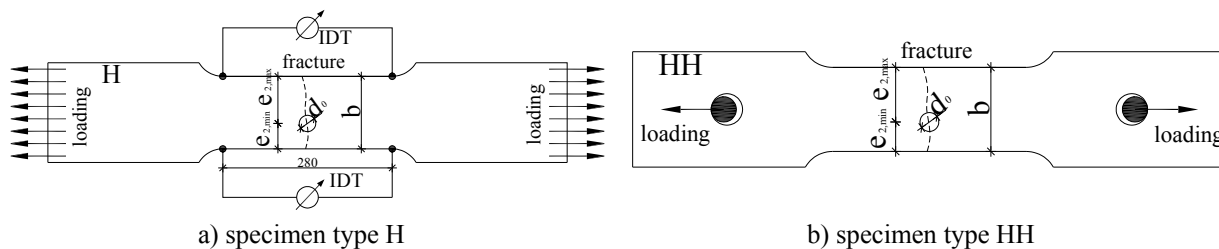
Specimen types H, HH – steel strips with holes subjected to tension
